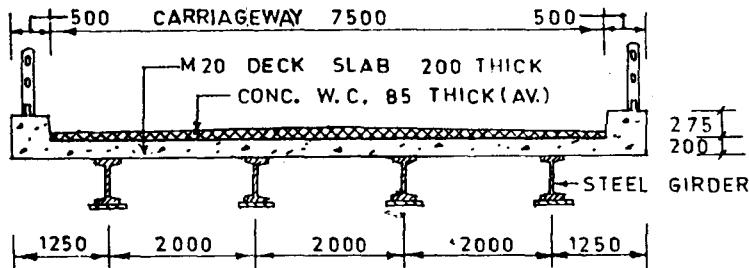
DETAILS OF DECK (Example 15.1)
